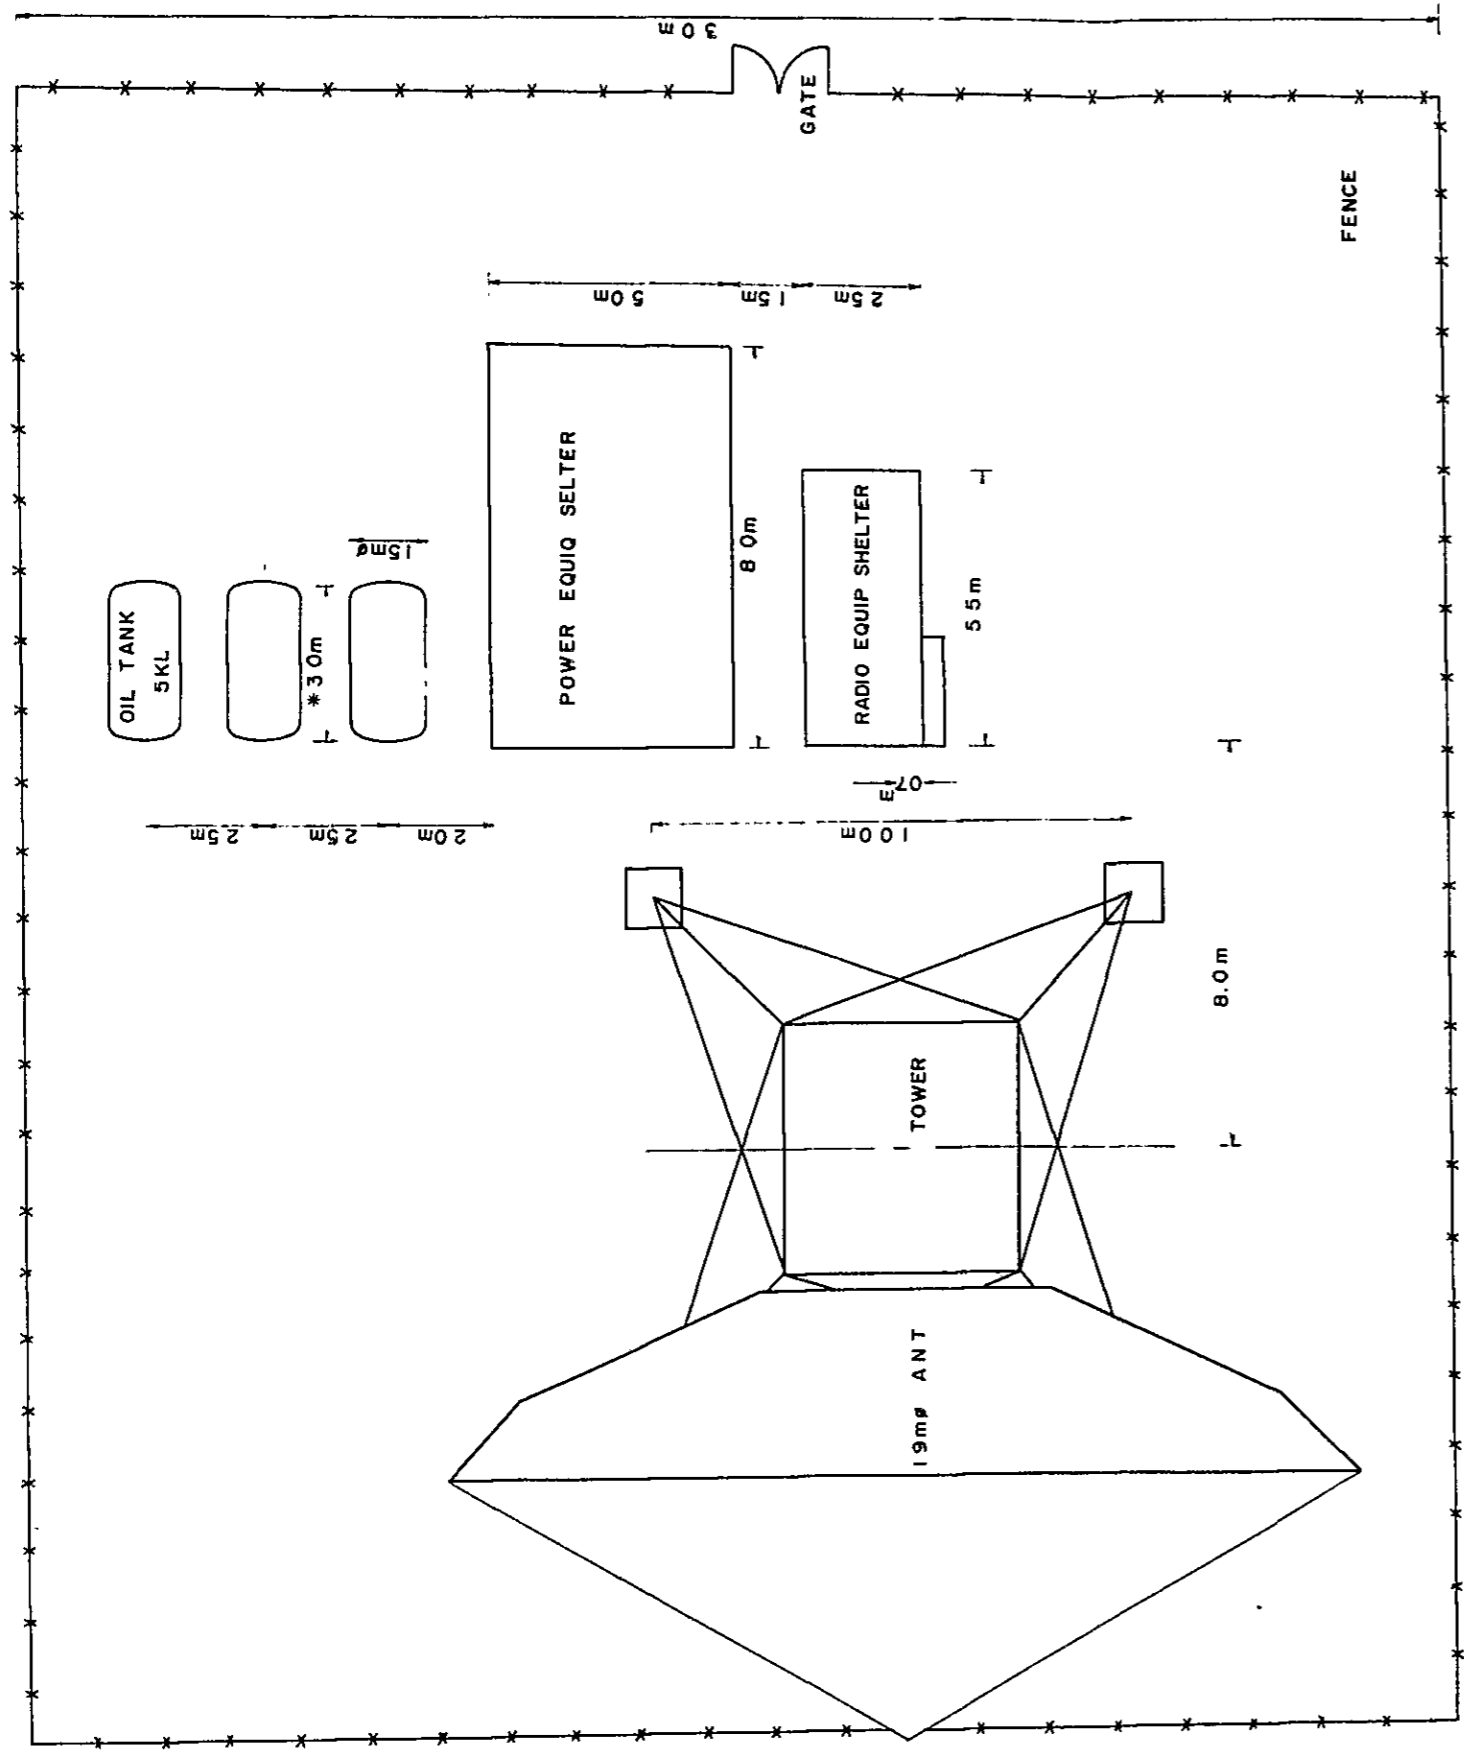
Typical Site Layout For Troposcatter Radio Station
